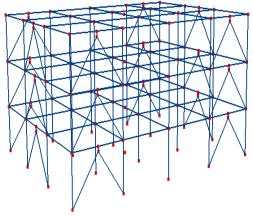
Elevation of the 3-story structure strengthened by eccentric bracing.
